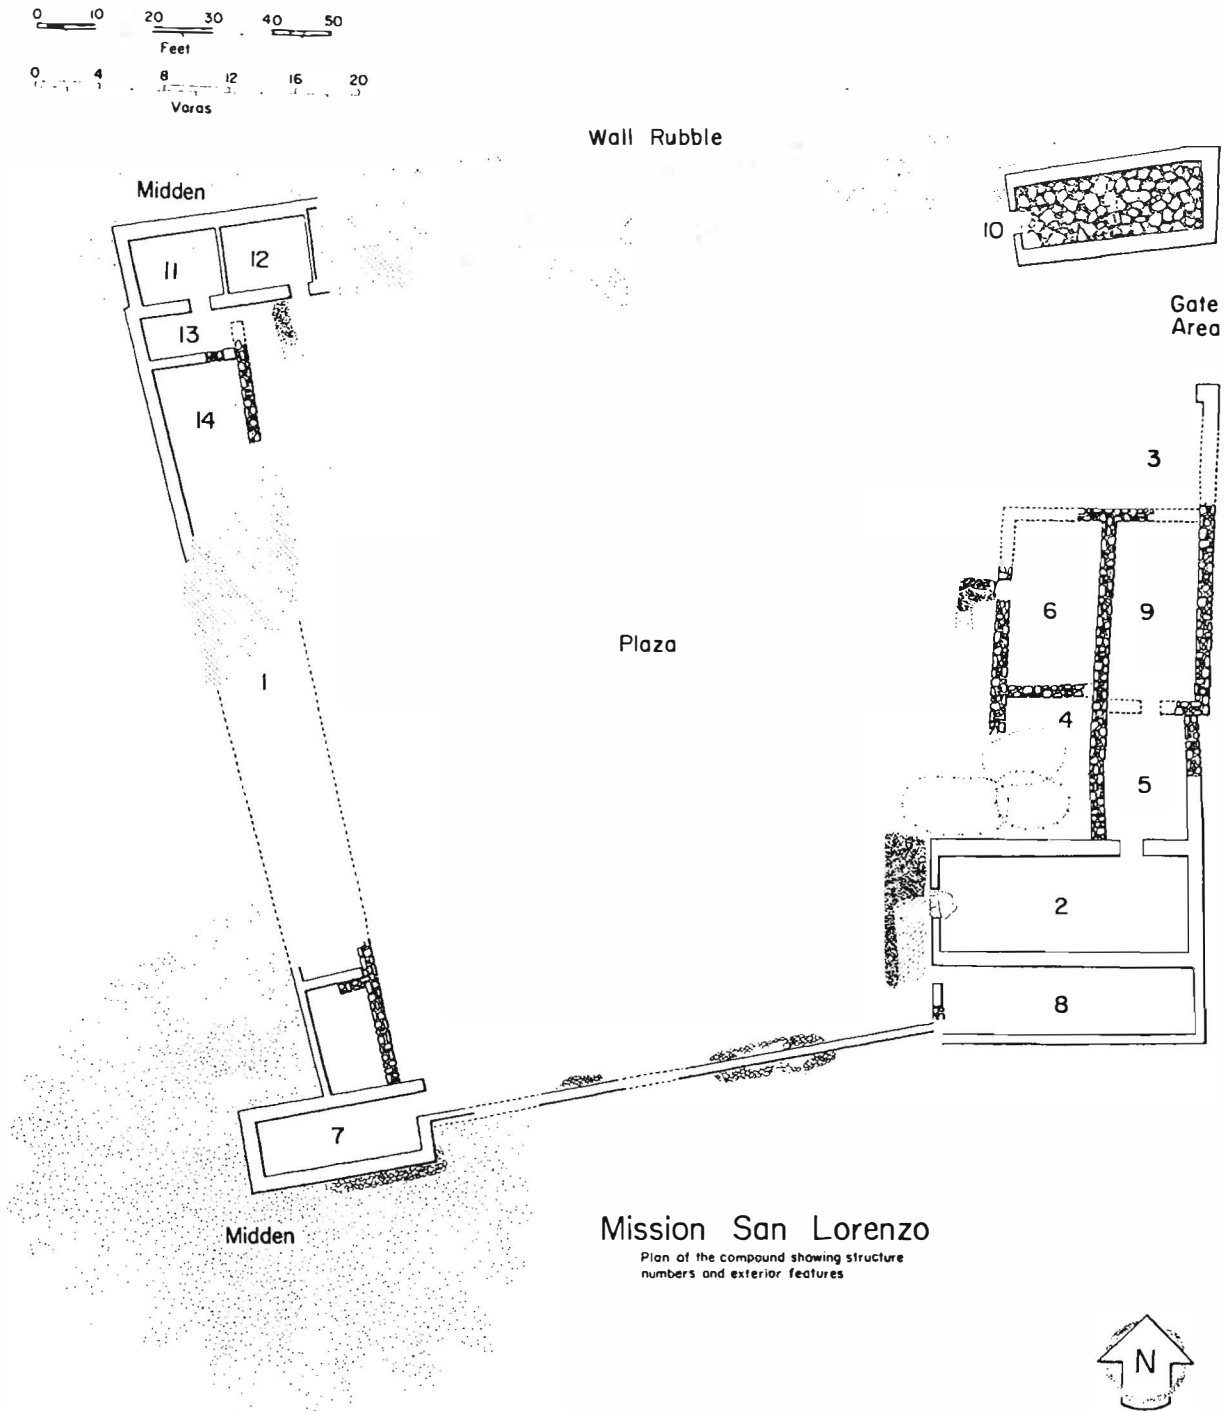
Plan of the compound. Structures 1, 11, 12, and 14 are living quarters; Structure 2, church; Structure 3, unidentified; Structure 4, storage area; Structure 5, sacristy; Structures 6 and 9, convent; Structure 8, stable; Structure 10, granary; Structure 13, kitchen. (Adapted from Tunnell 1969: Figure 3, courtesy of the Texas Historical Commission.)
